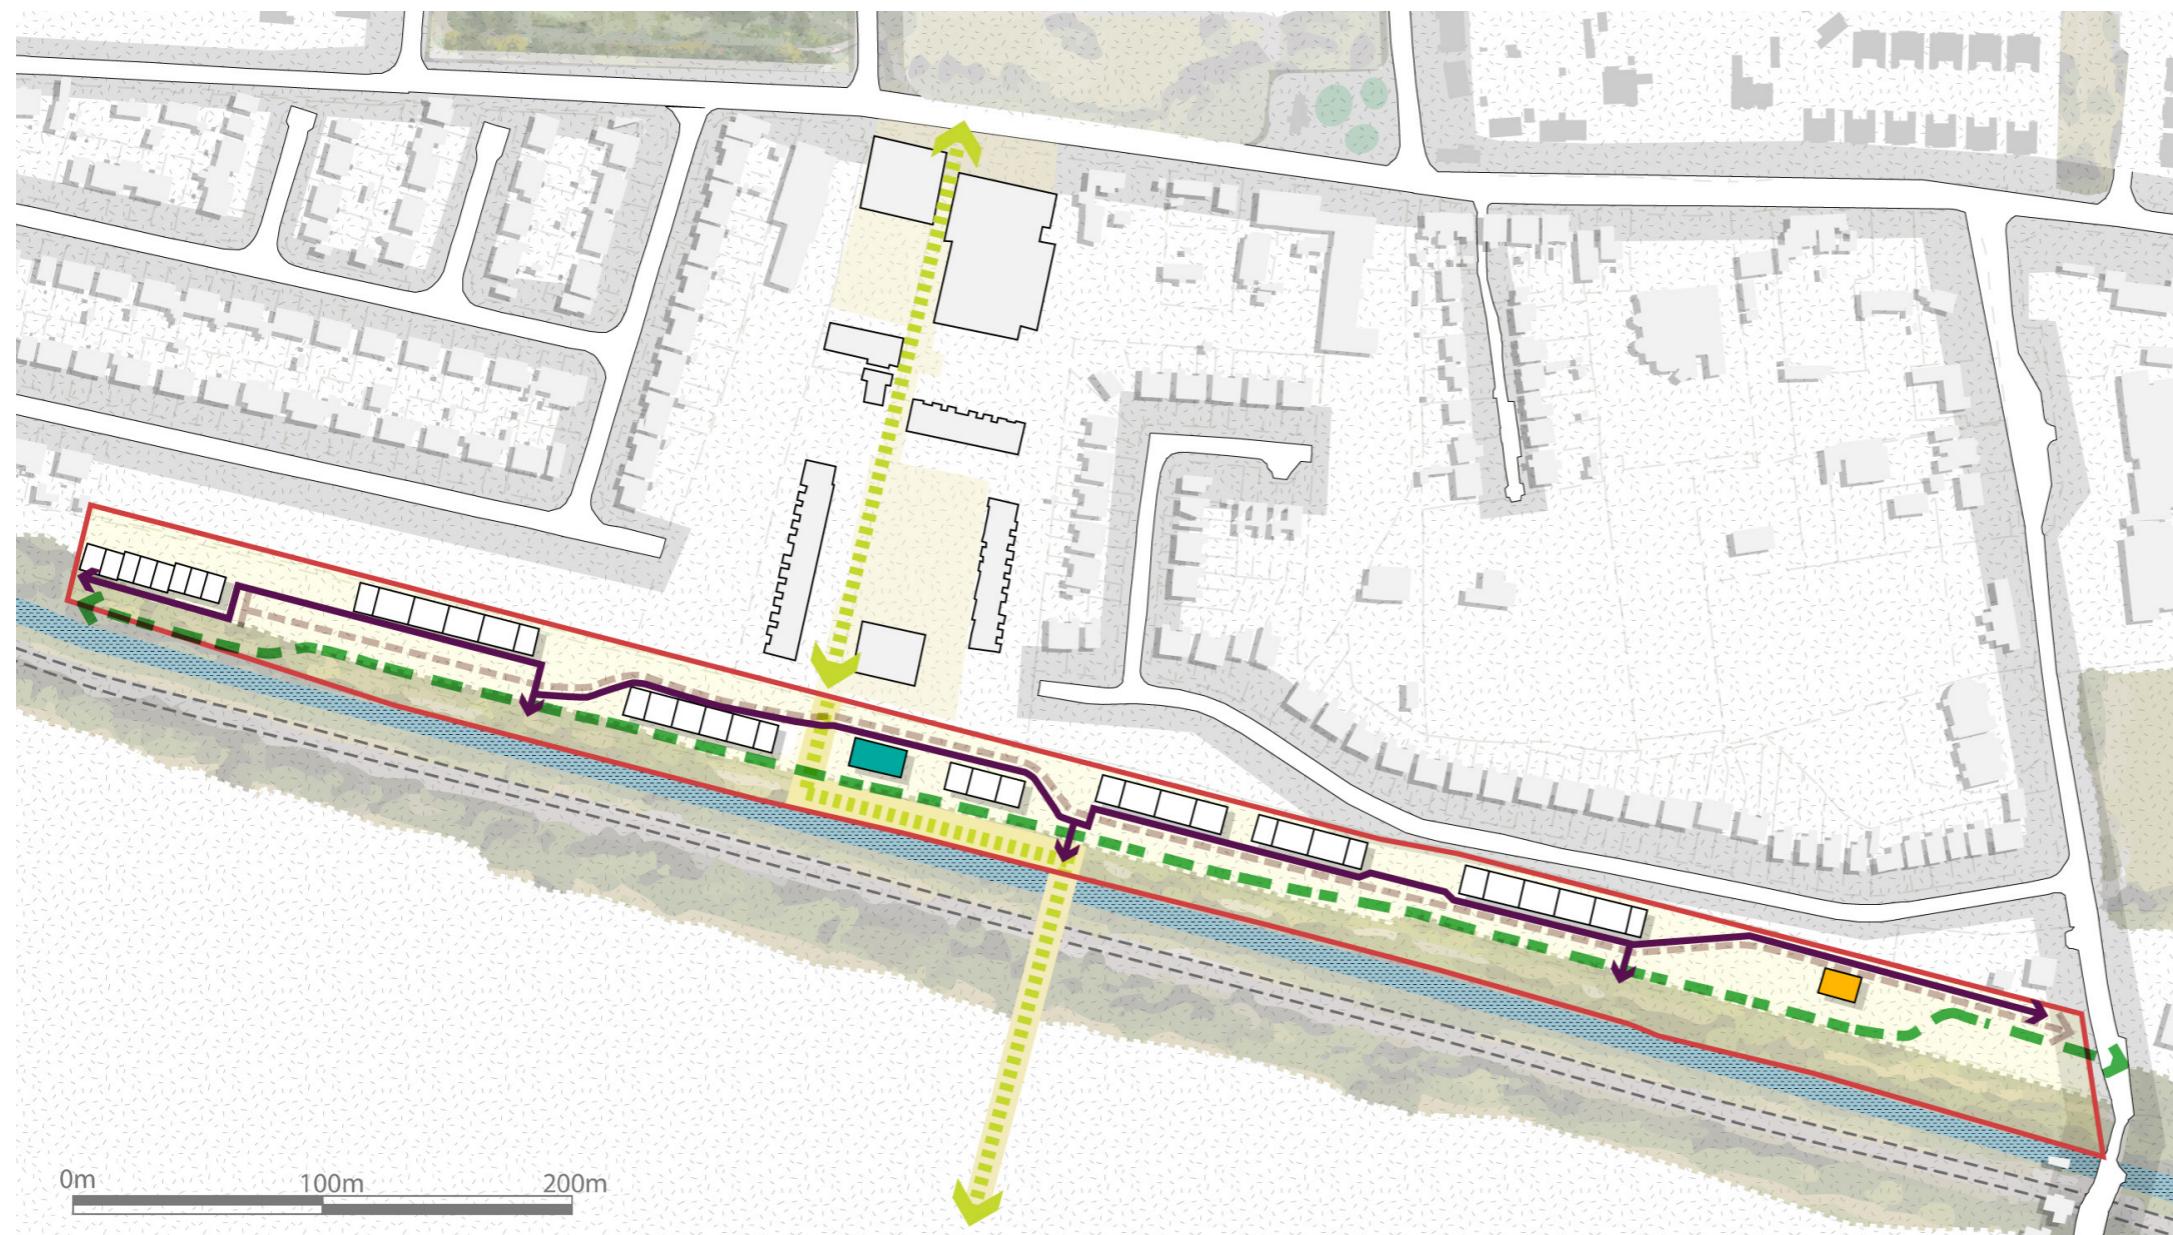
illustrates the access road location through the lands. The route of the internal road has considered potential systems to permit the road to traverse root protection areas (RPA) as a design solution. Works around the RPAs could be done with the following methods:
